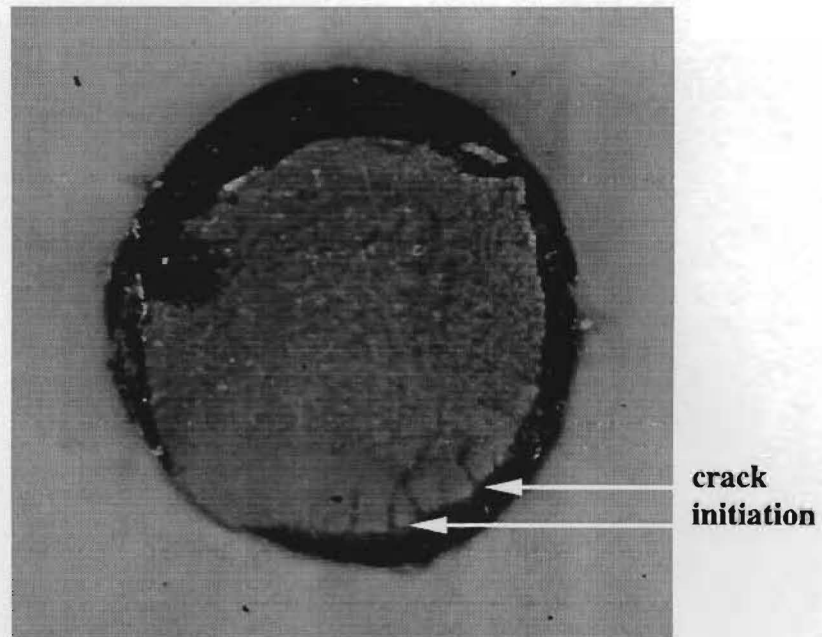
Fatigue Crack Surfaces on Ch4S60 Bars
